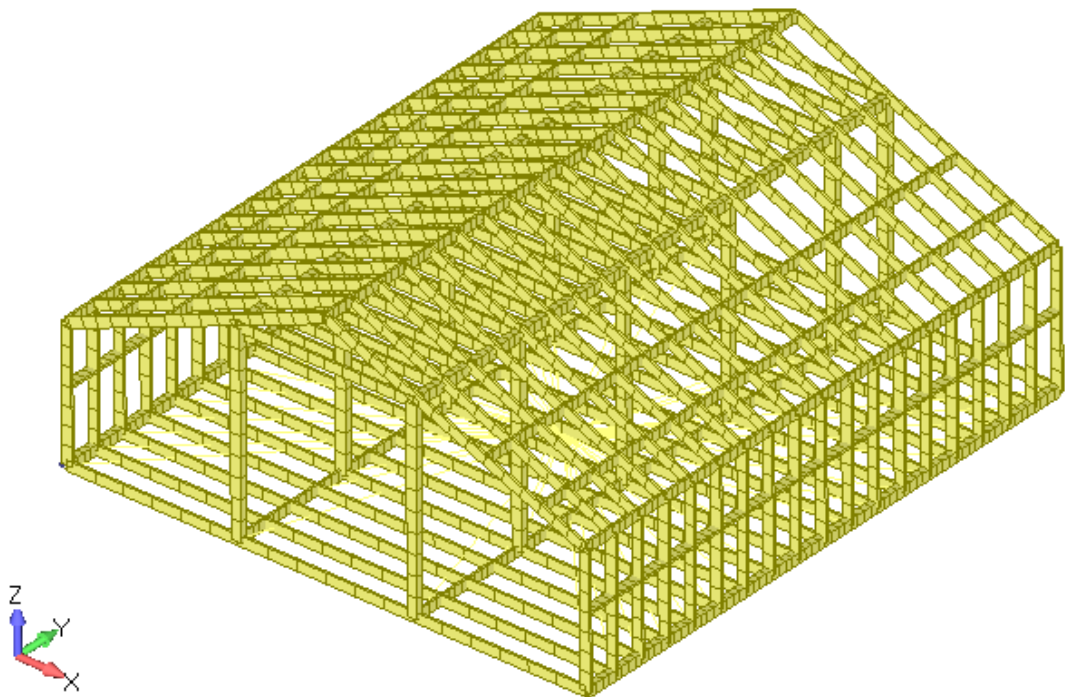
General view of the FINHA T200 building frame, frame width 10.5 m
